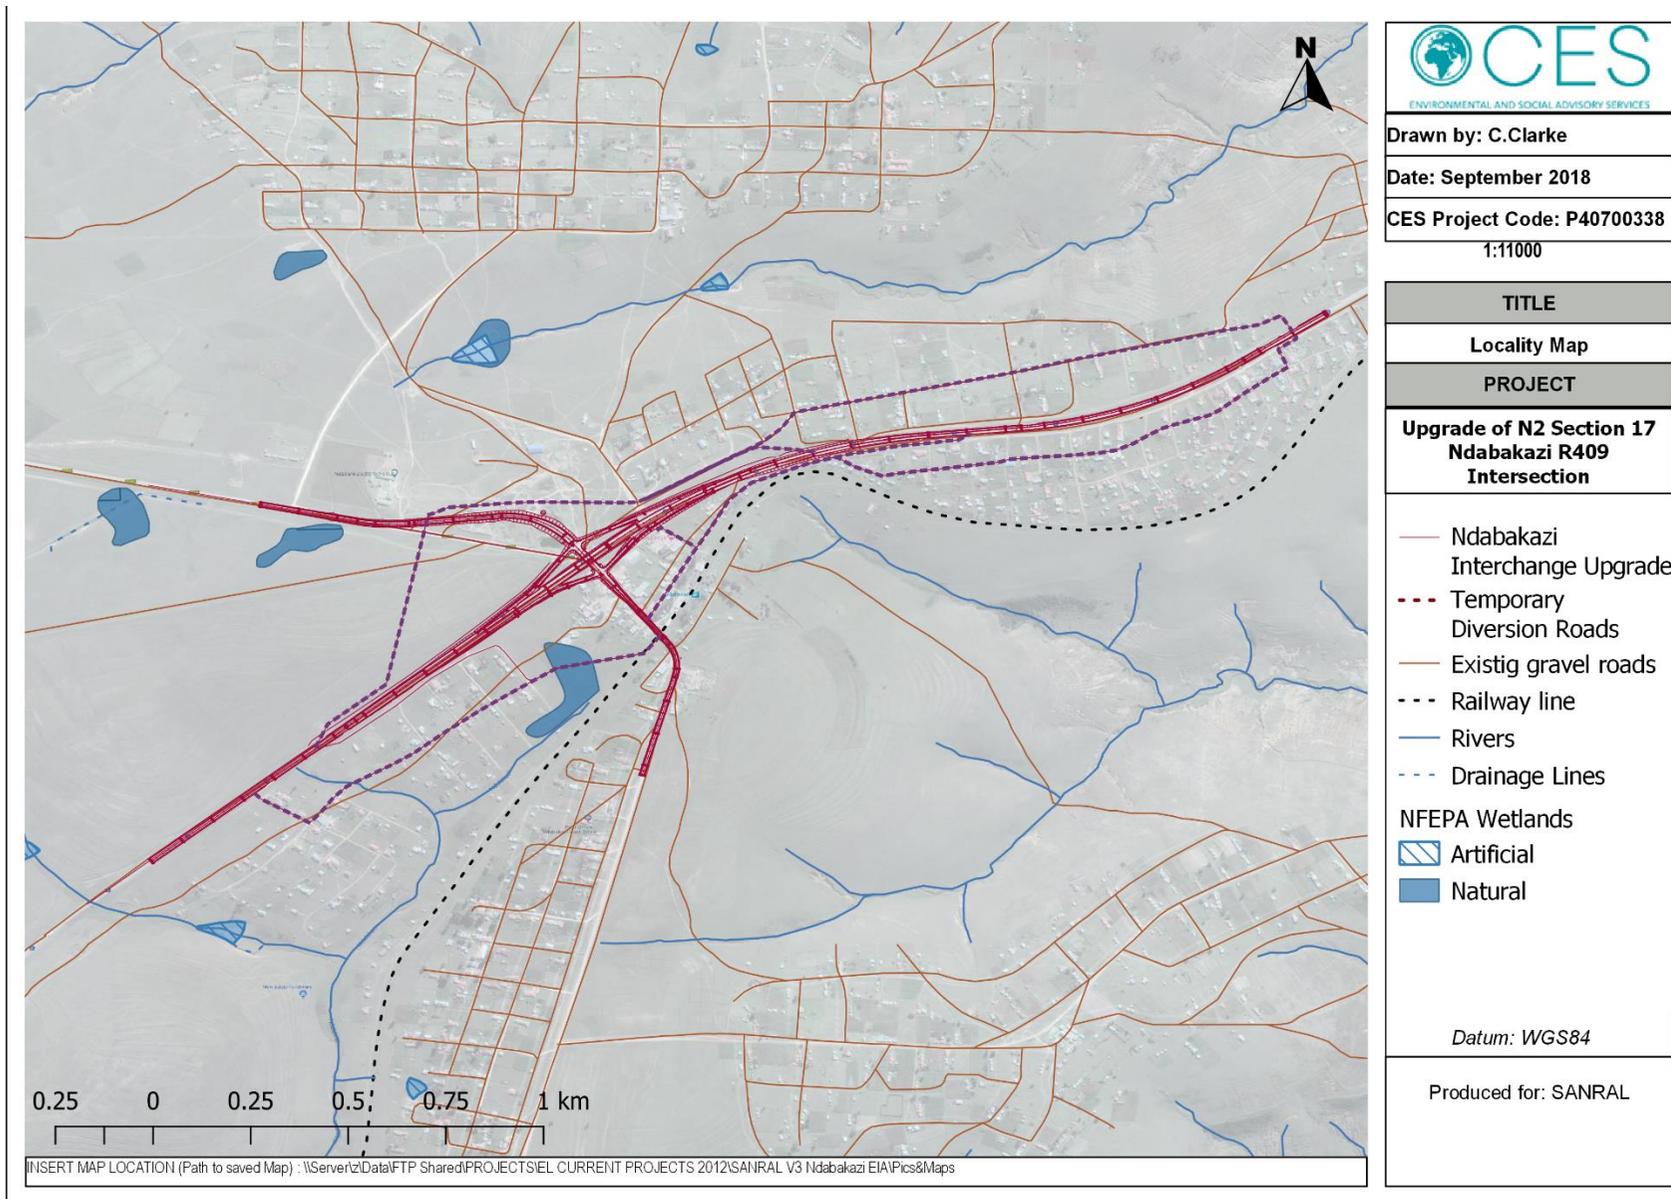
Proposed construction of the N2 Ndabakazi – R409 Interchange.
